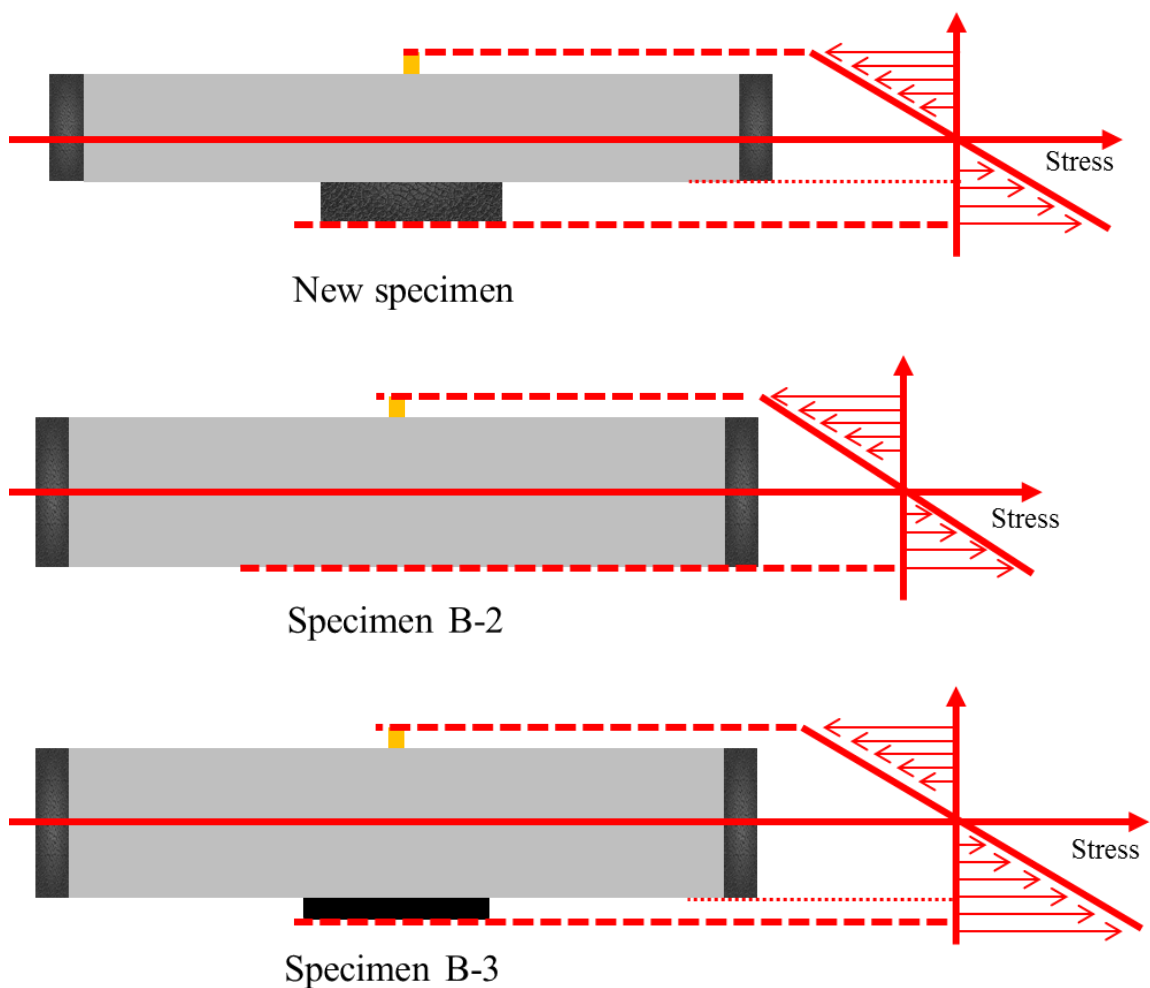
Stress distribution of proposed new specimen, specimen B-2 and specimen B-3.
